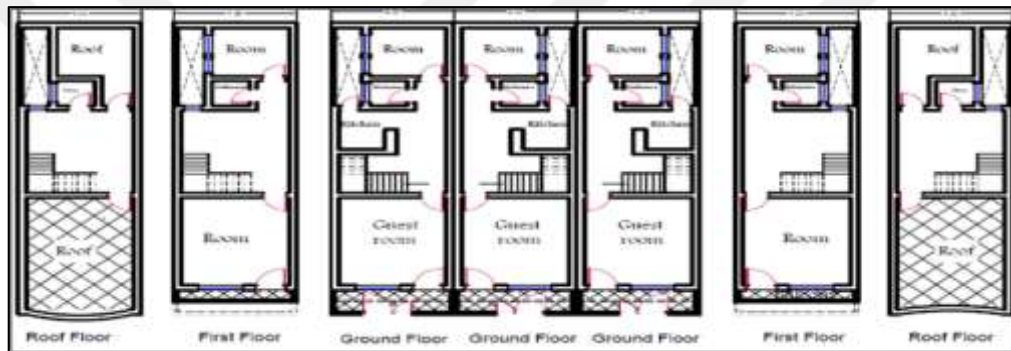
The Plan of ABDUL ALRASHEEDYS House in Baghdad.
